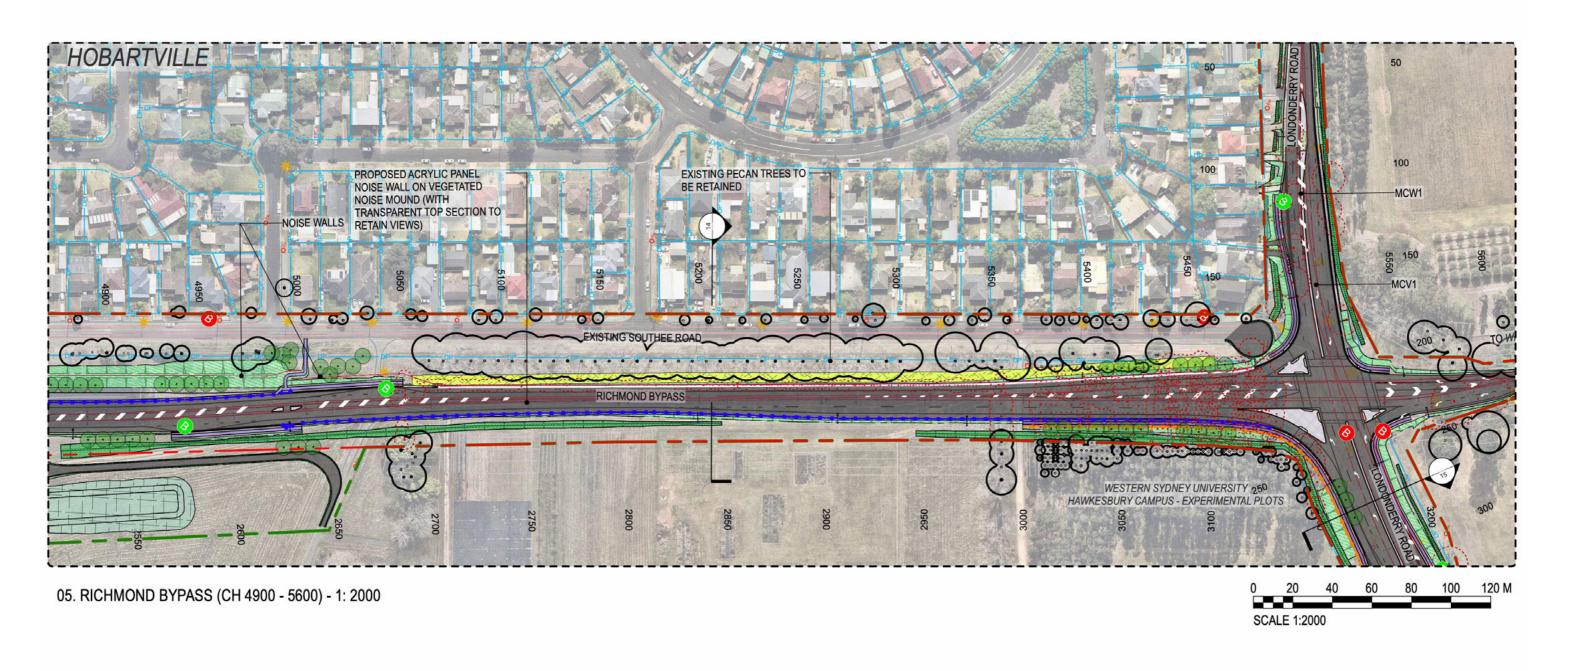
Stage 2B urban design plans - sheet 3 of 3
